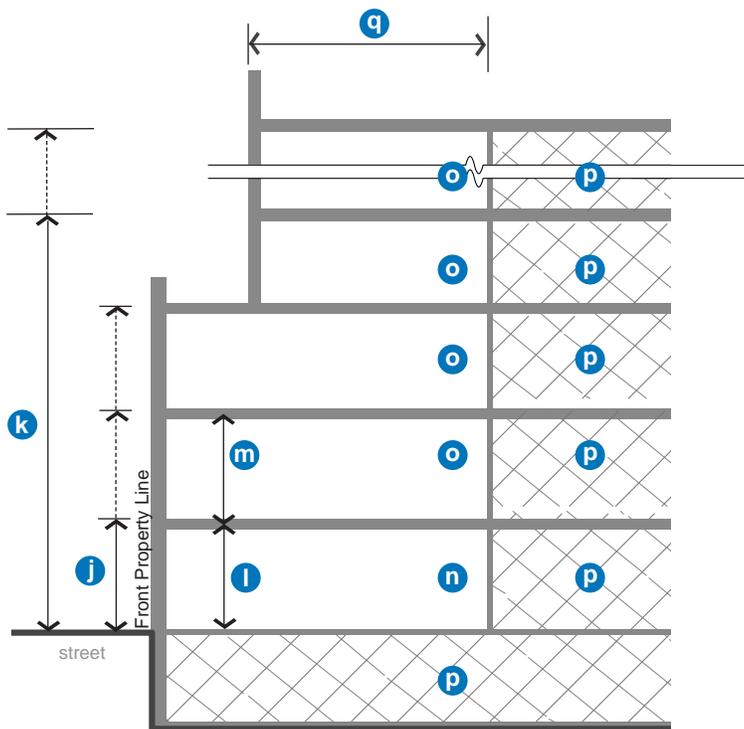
(2). Storefront Building: Height & Use Requirements.
